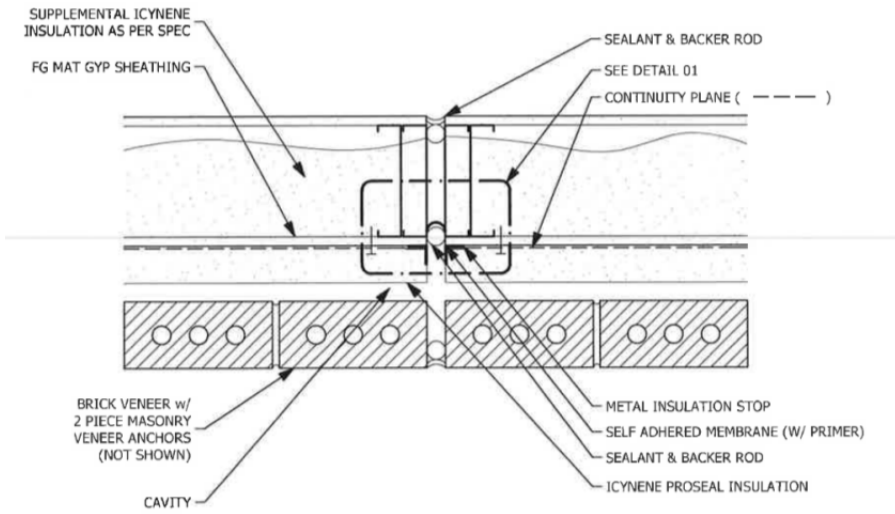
"Icynene ProSeal Air Barrier System" expansion joint sealing and continuity detail
